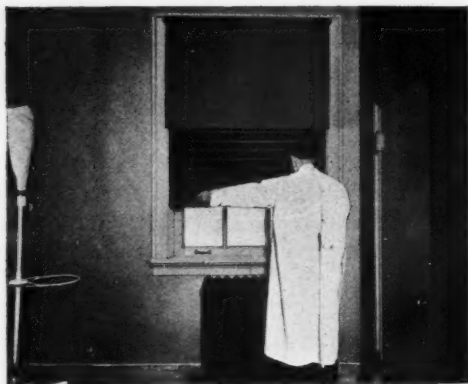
Ventilating window sashes are provided in all rooms requiring darkening. These consist of interlocked C-shaped columns of galvanized iron which give free access to the air, but exclude the light. Raising or lowering the outside sash allows air to enter or excludes air entirely.
